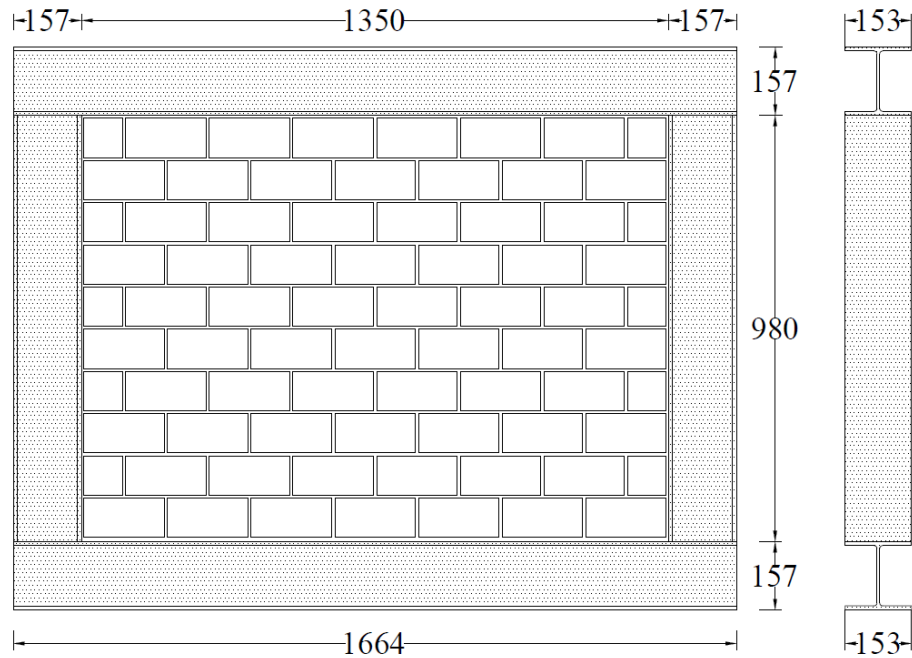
Details of Steel Infilled Frame Specimen (unit: mm)
